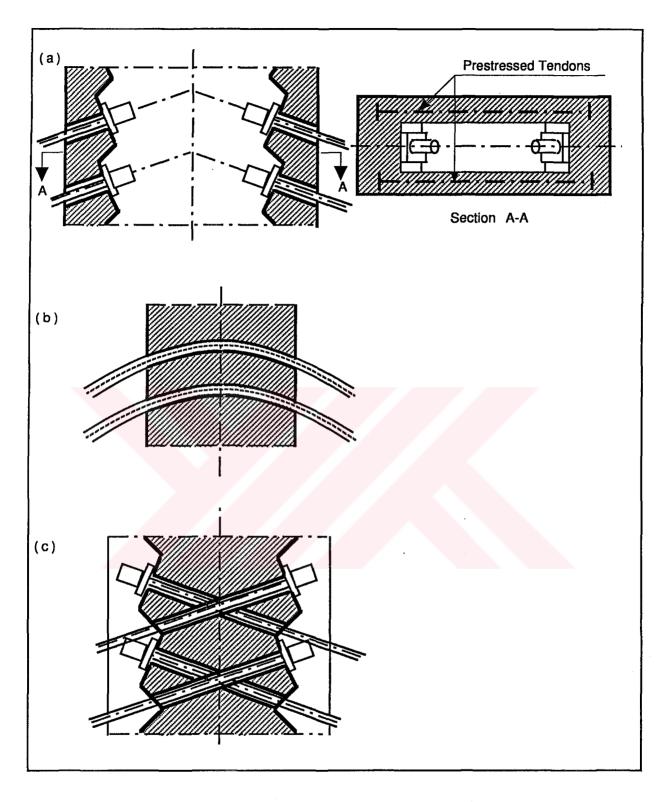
THREE SOLUTIONS FOR THE ANCHORING OF MONO-STRAND CABLES TO A CONCRETE PYLON
